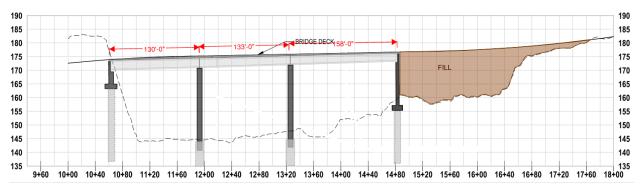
Option 3 - Three-Span Prestressed Concrete Girder Bridge Elevation (Spans: 130, 133, and 158 feet)
